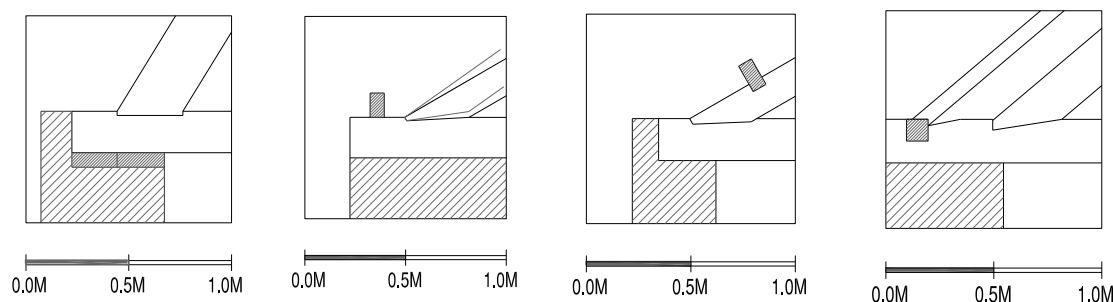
Addition of new long struts connecting roof purlins at different levels [credits Alice Tavares]
